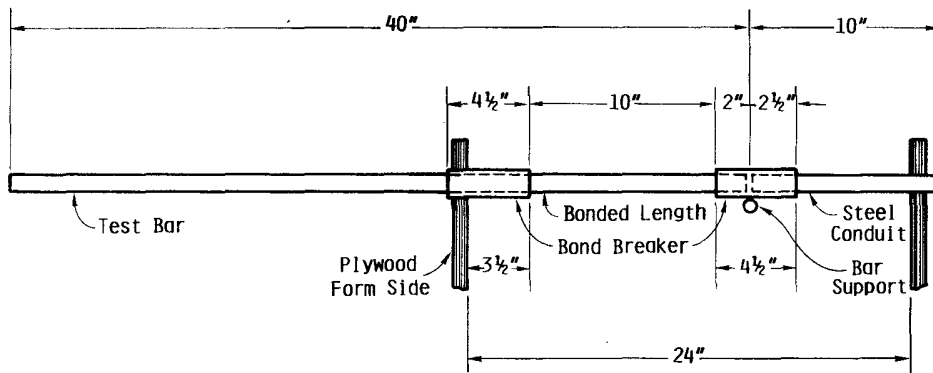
Test bar installation (1 in. = 25.4 mm)
